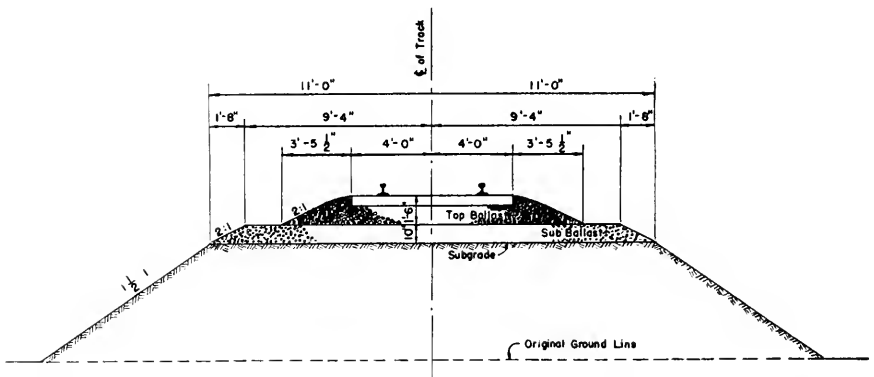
Typical embankment section, M-K-T Denison Dam relocation.
